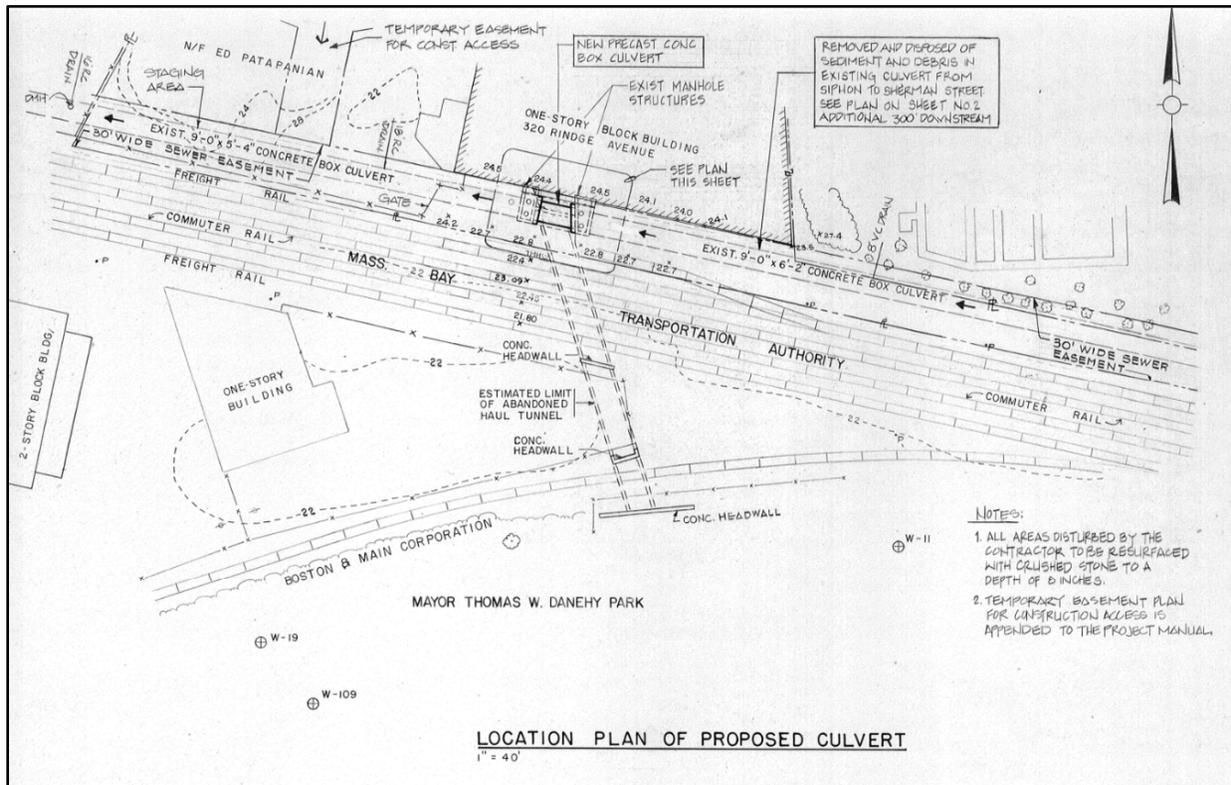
CDM Record Plan – Siphon Replacement Plan and Section – July 1991
